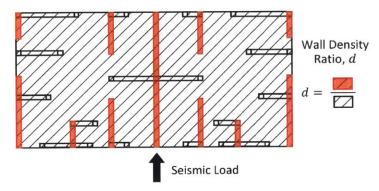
Wall density illustrated in the floor plan view above (derived from Meli et al. 2011).
